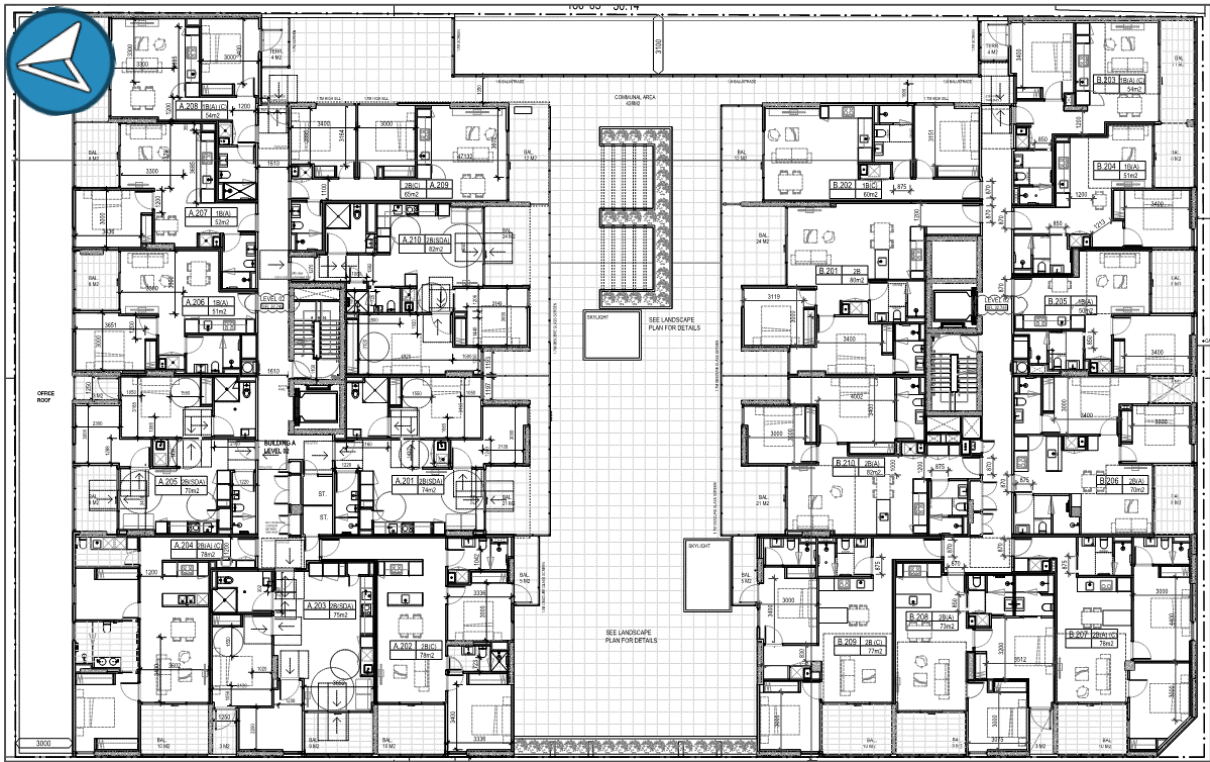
Proposed Floor Plans – Level 2 (Image Source: Artisan Architects)
